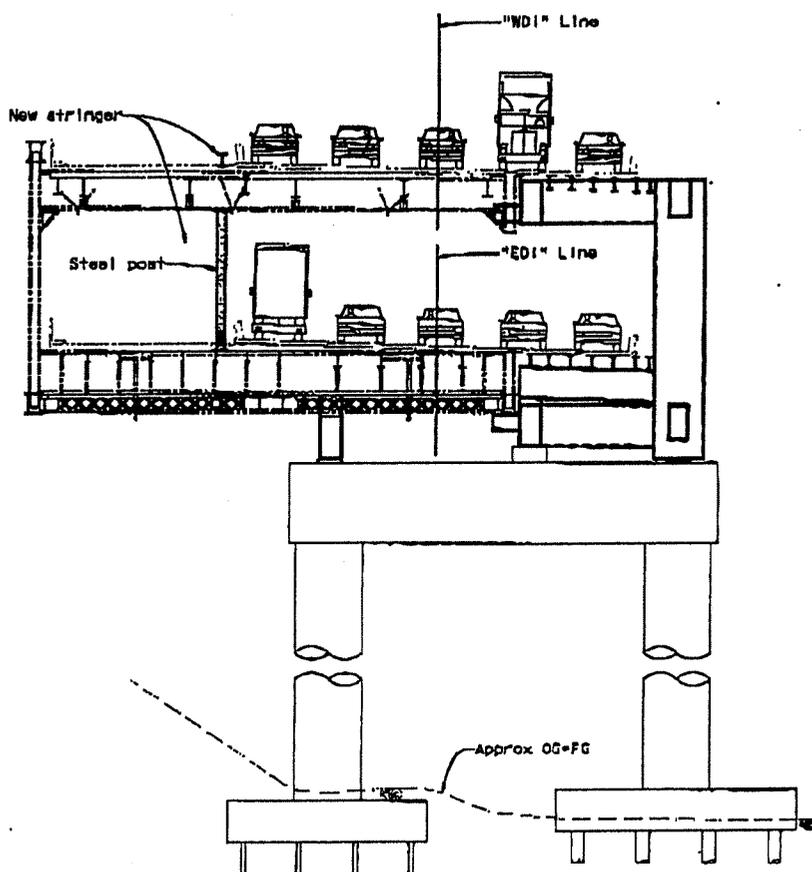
Stage 7 – Placement of Upper Deck Support
